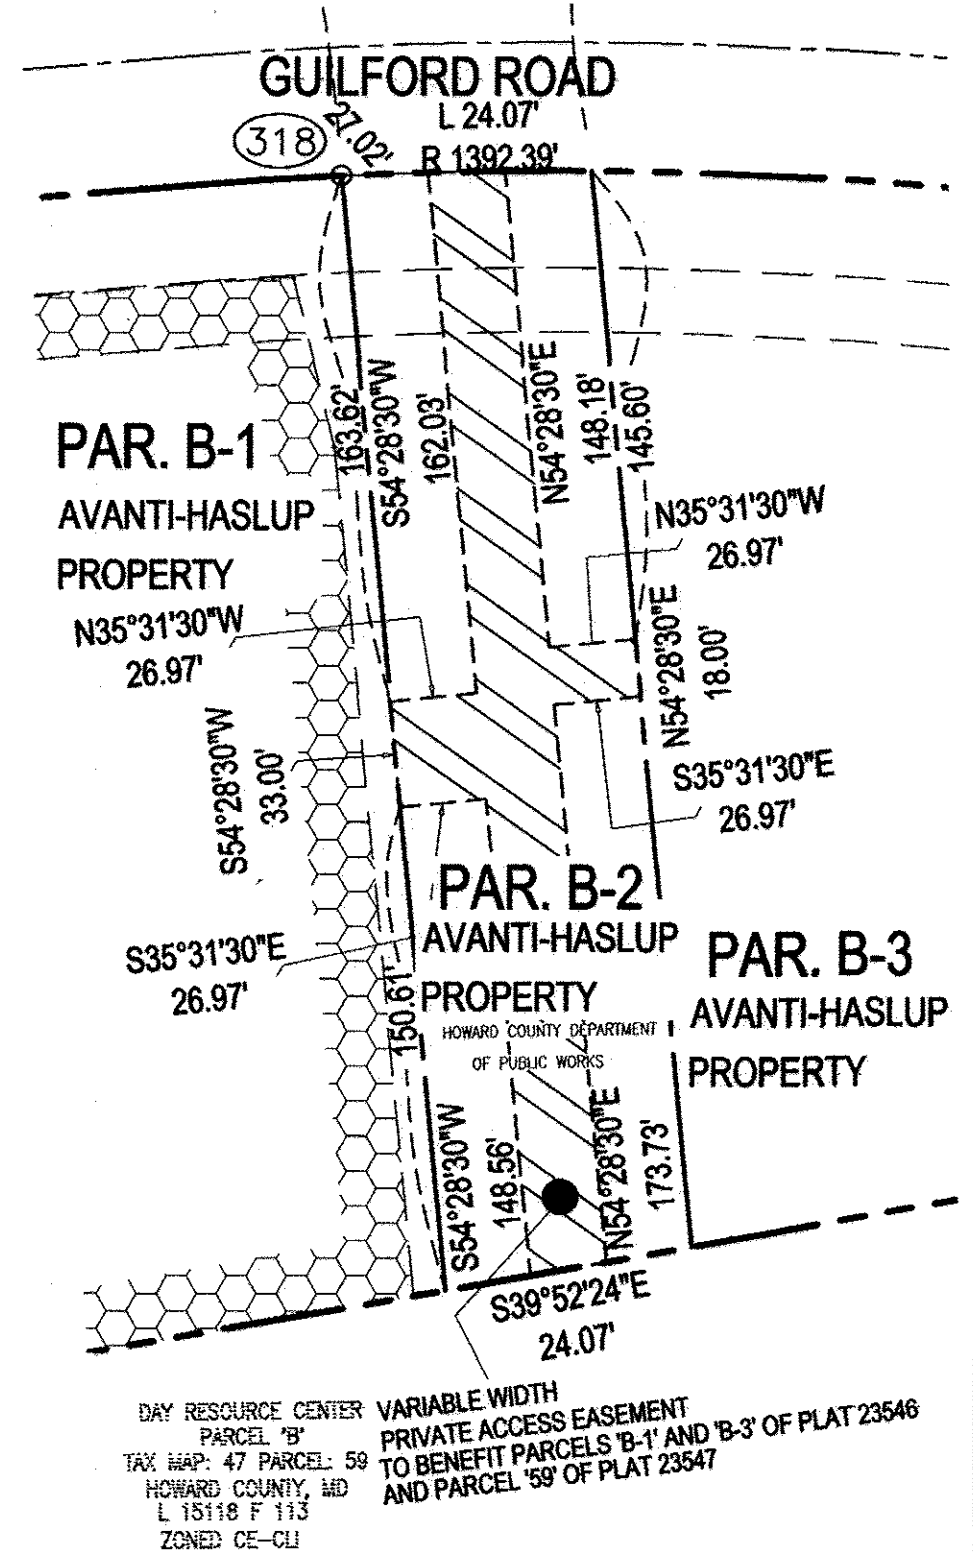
DETAIL OF PUBLIC WATER & UTILITY EASEMENT
